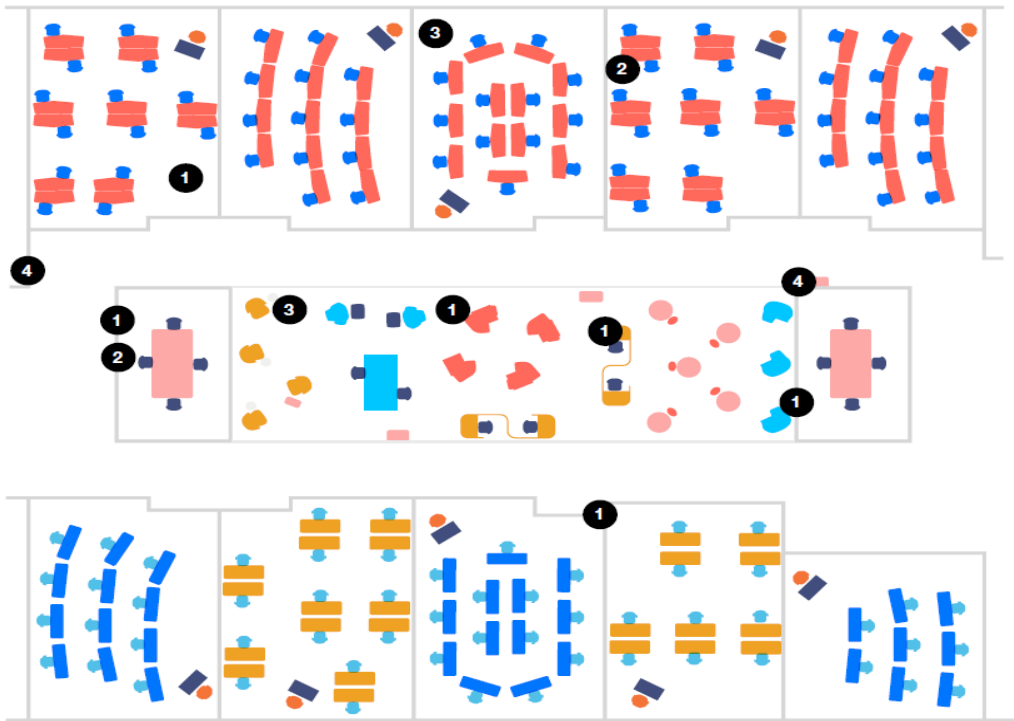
The adjusted floor plan after application of design considerations (Steelcase Education, 2020)
